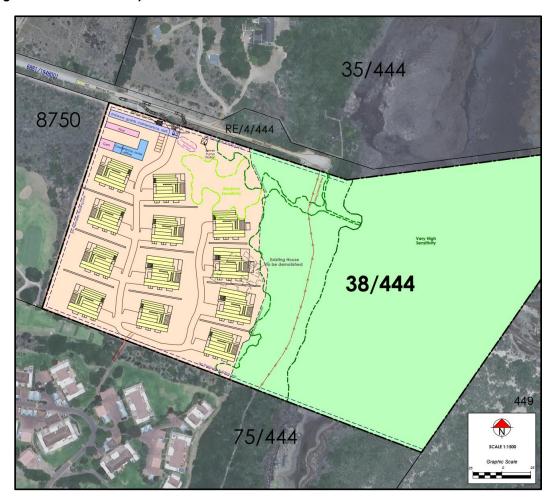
Proposed site development plan (Marike Vreken Town and Regional Planners, 2023).
